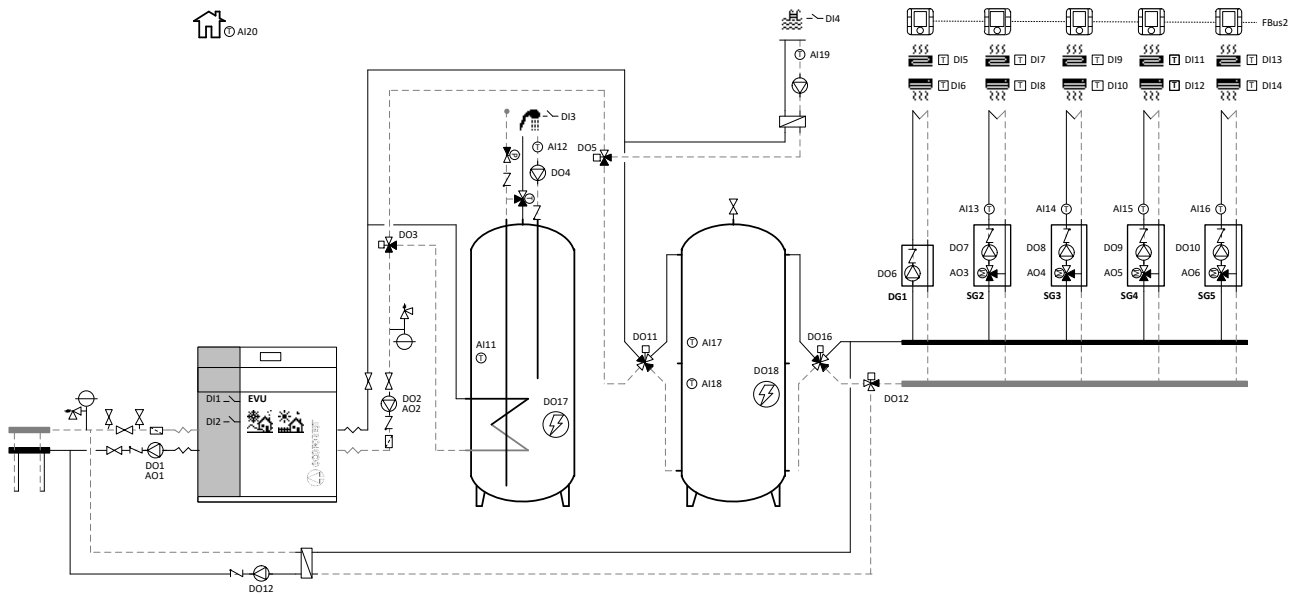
Wiring scheme using one buffer storage tanks (ecoGEO HP3 models).
